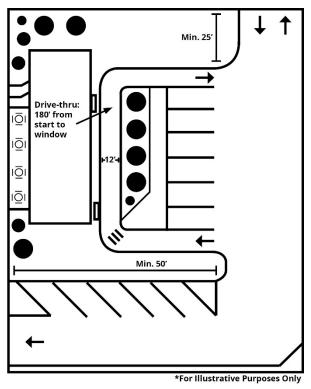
### Exhibit A: Section 15.34.190 Drive-Thru Facilities
